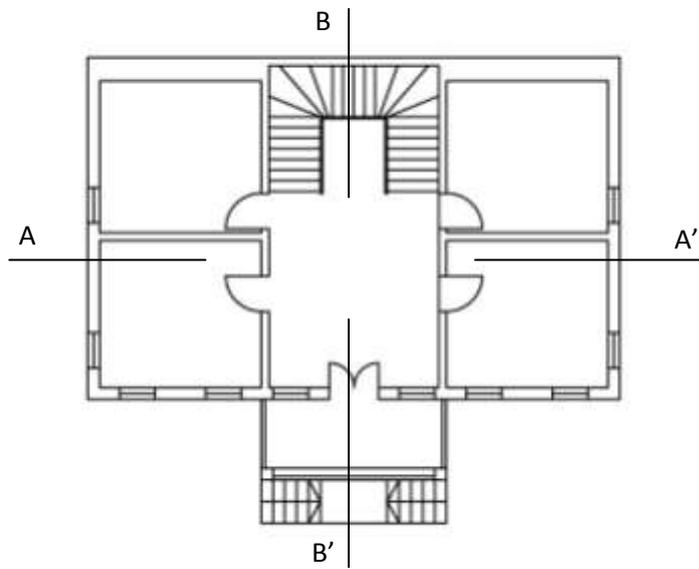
Ground (entrance) floor of the house at 148 lot 1 parcel
